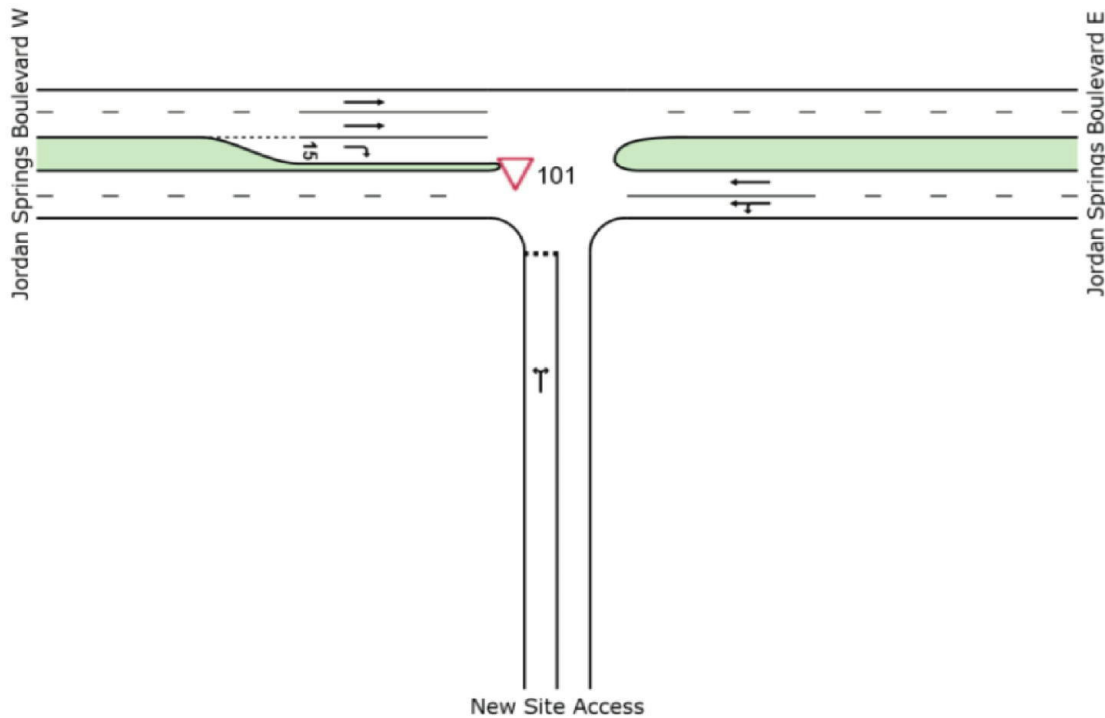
Proposed new intersection (Source: Bitzios Consulting)
